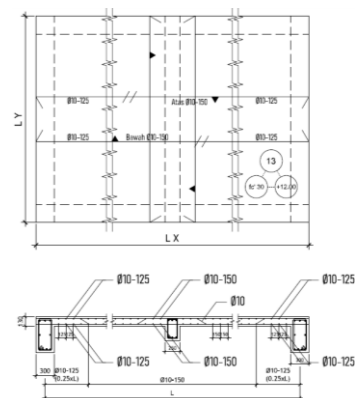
Details of t13cm plate reinforcement Source: Personal documentation
